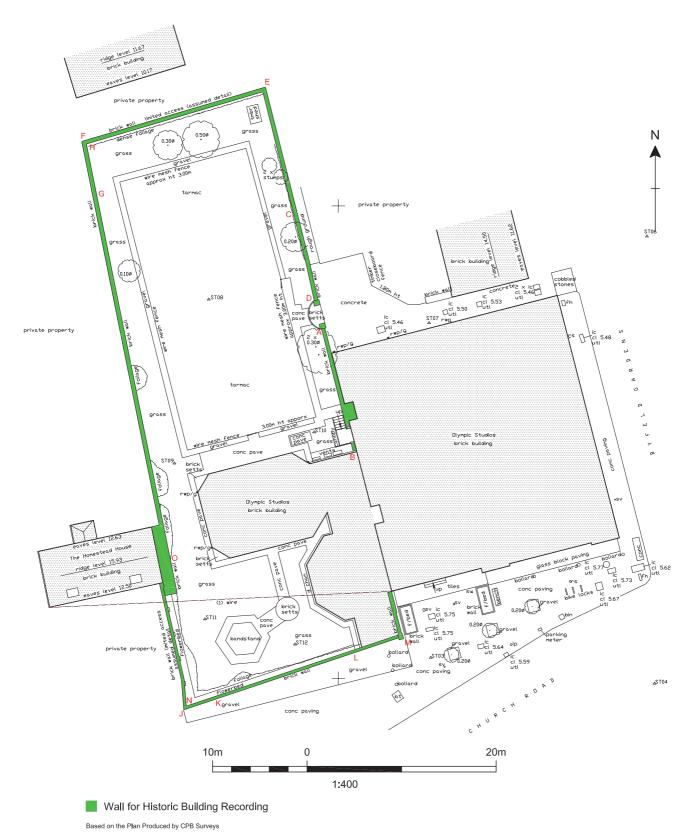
Detailed Site Location Outlining the Recorded Boundary Wall
